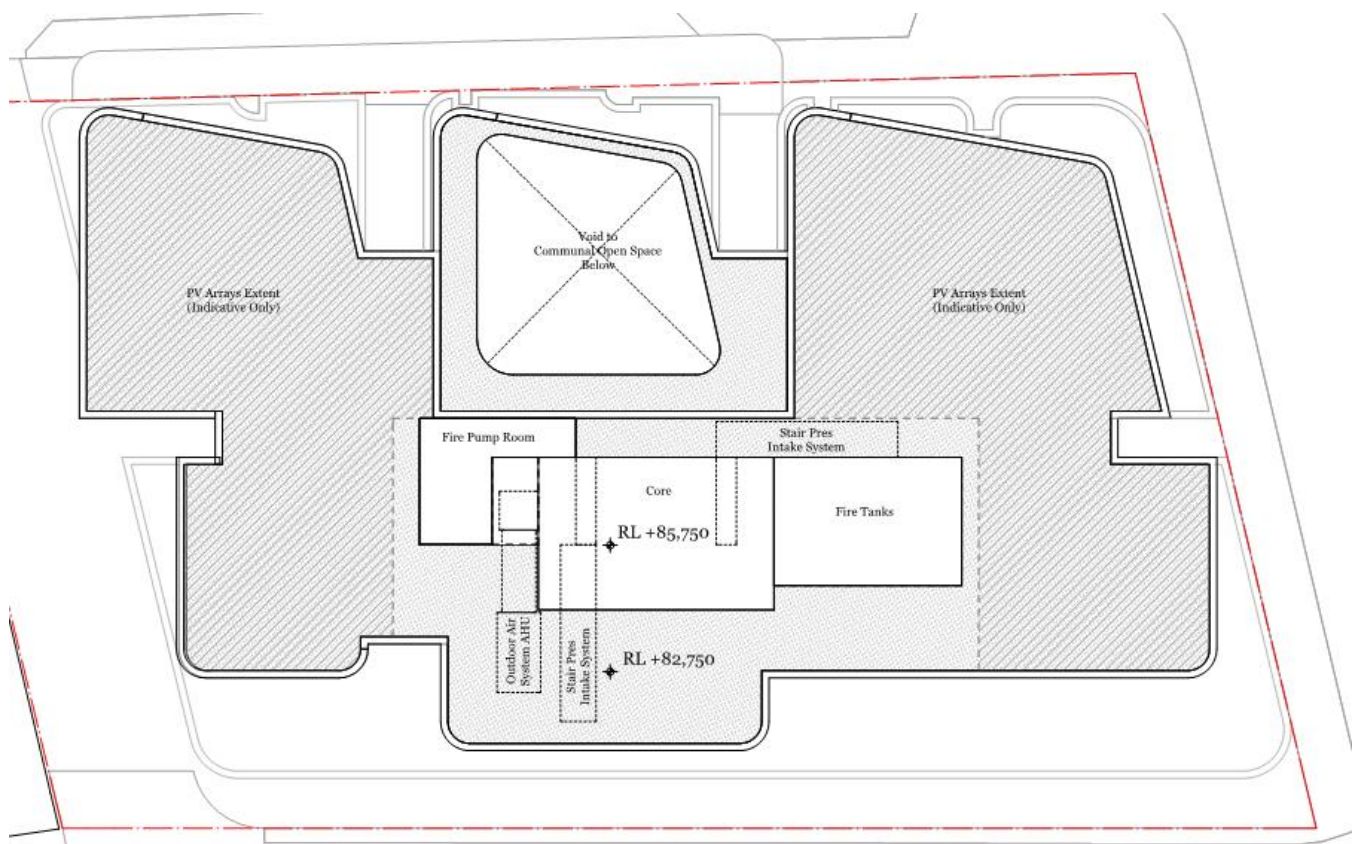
Roof Plan for SGCH Gibbons Street Indicating PV Array Area
